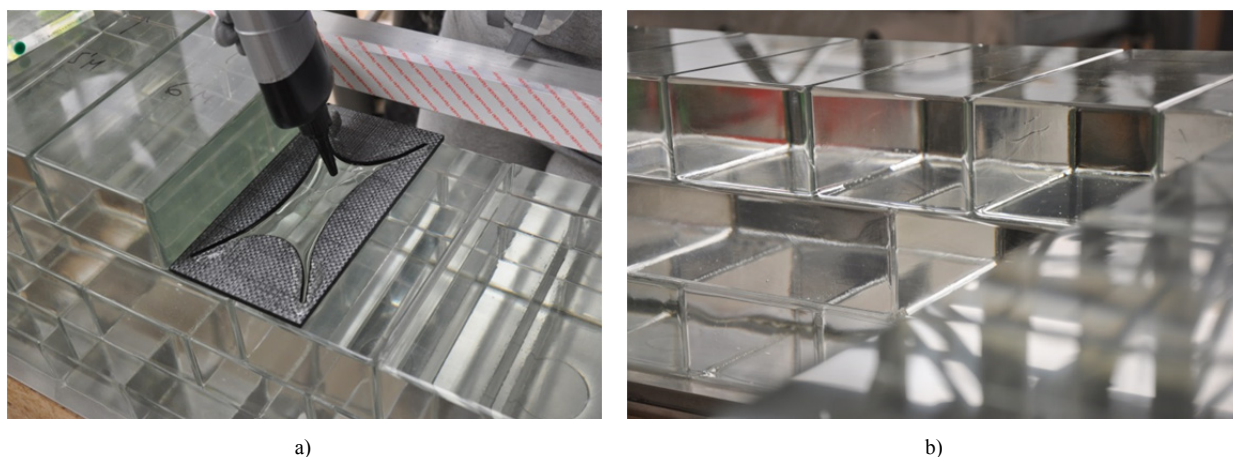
a) Mould used for the bonding of the bricks. b) End result after bonding.
